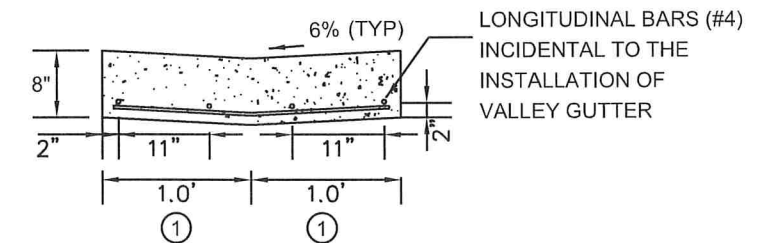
MODIFIED CURB & GUTTER B412 MODIFIED CURB & GUTTER B618 MODIFIED CURB & GUTTER
